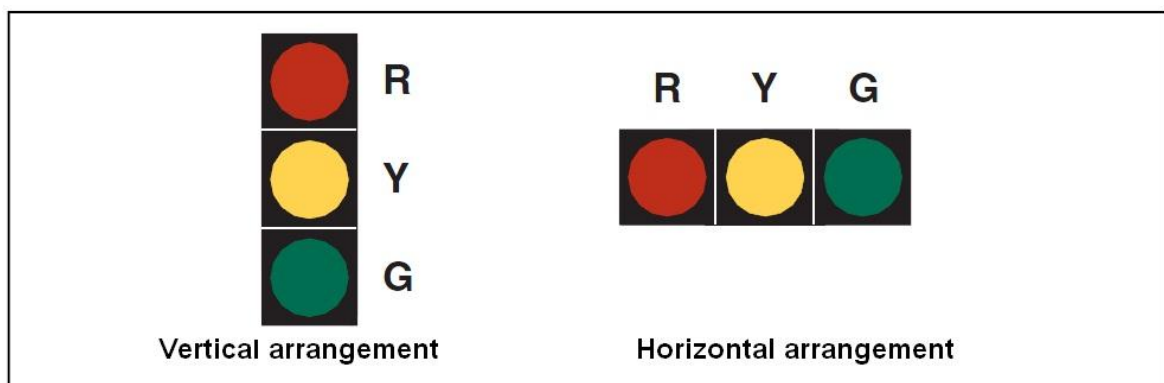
/2: Arrangement of Indications in Traffic Signal Faces [1, p.455]
